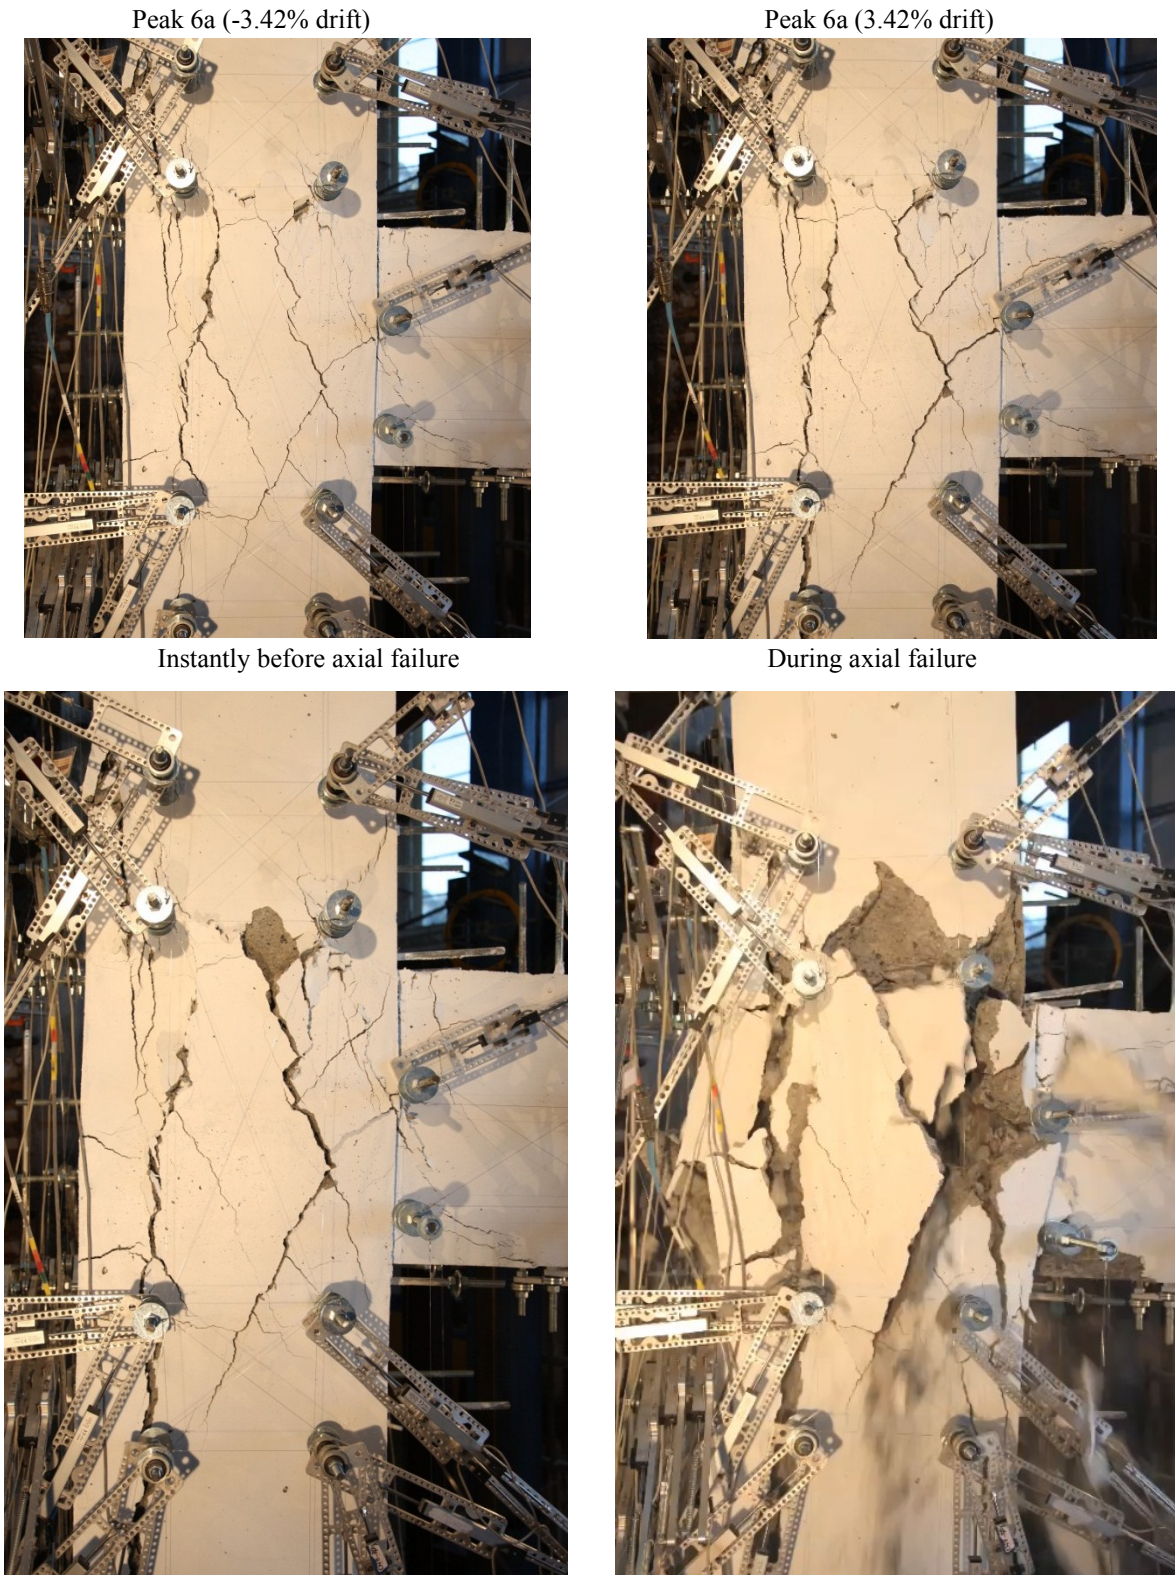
(Continued) Crack development and distress of Specimen B-J-1 north joint face
